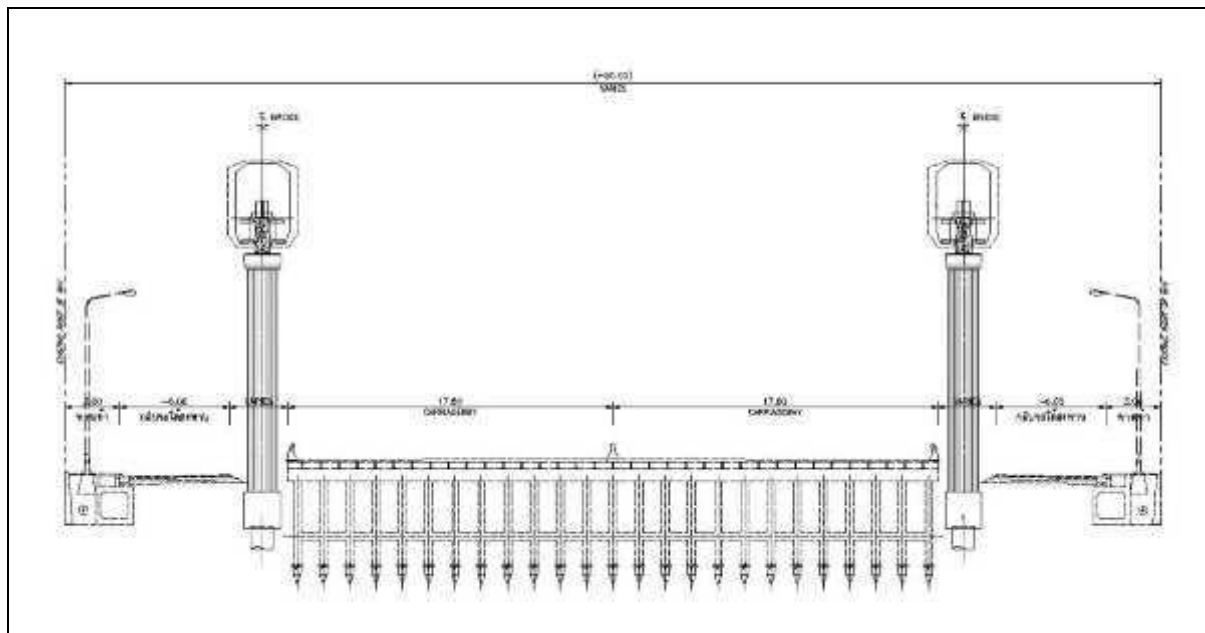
8 Cross section of road at Prawet Burirom Canal, 4<sup>th</sup> Alternative
